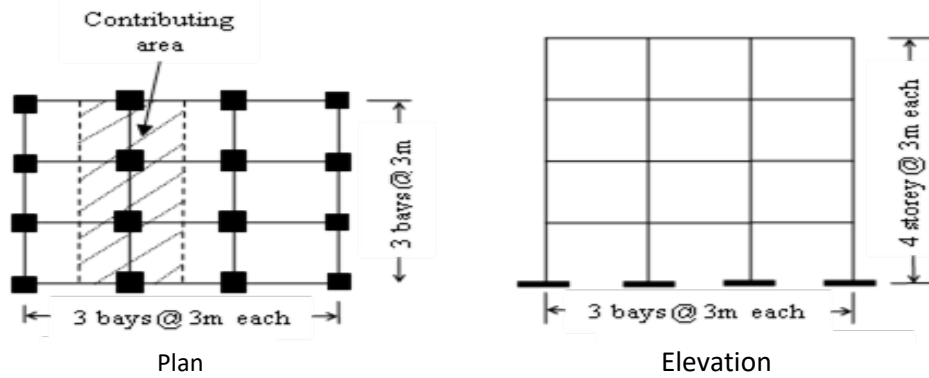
Considered example of Moment Resistant Frame plan and elevation
